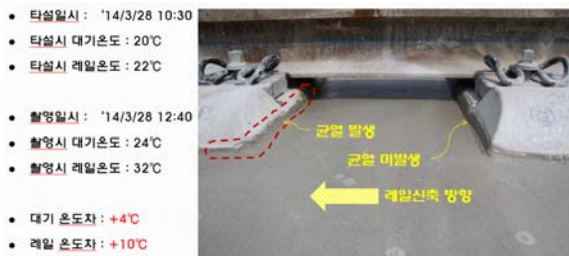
Concrete crack after 2 hours pouring concrete
